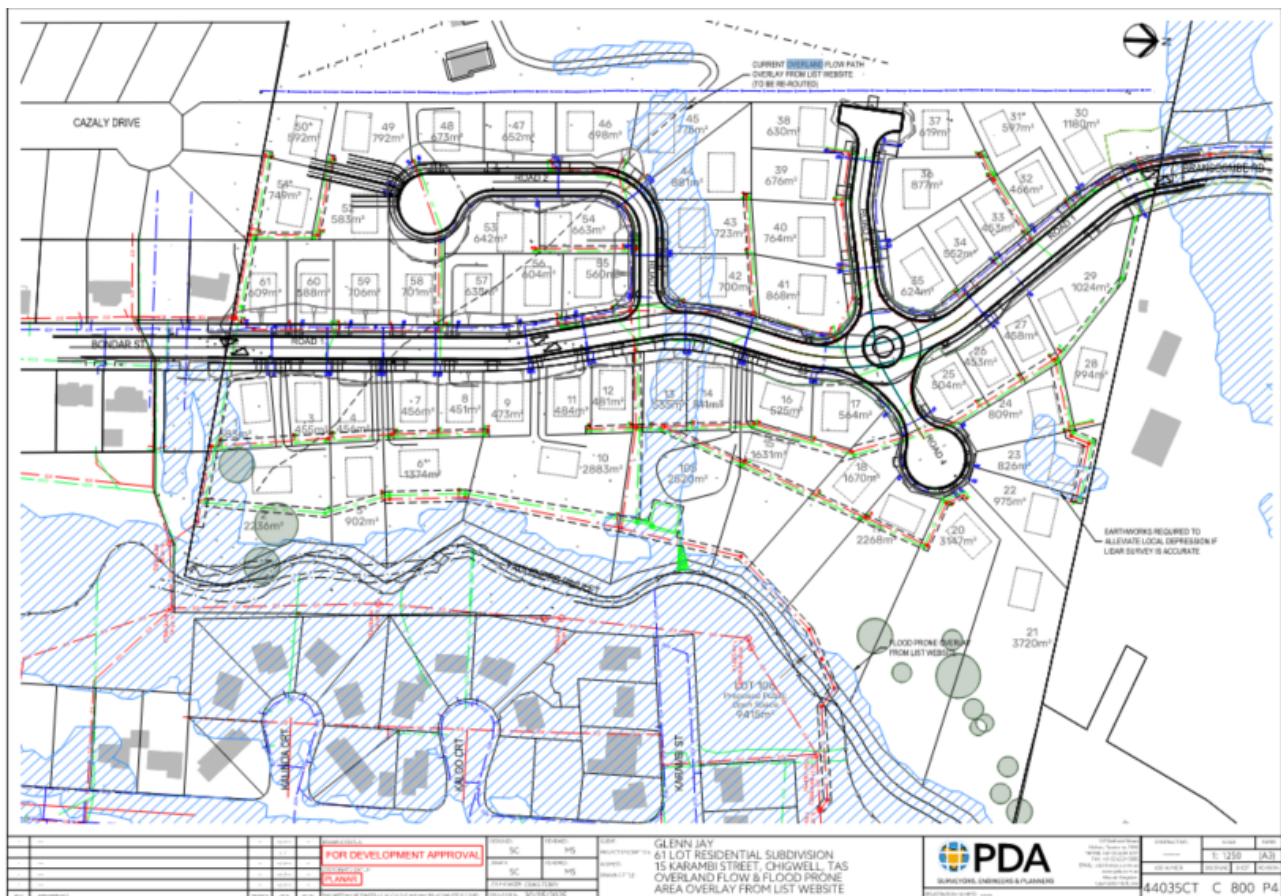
Post Development lot layout over existing Flood Hazard Code overlay
